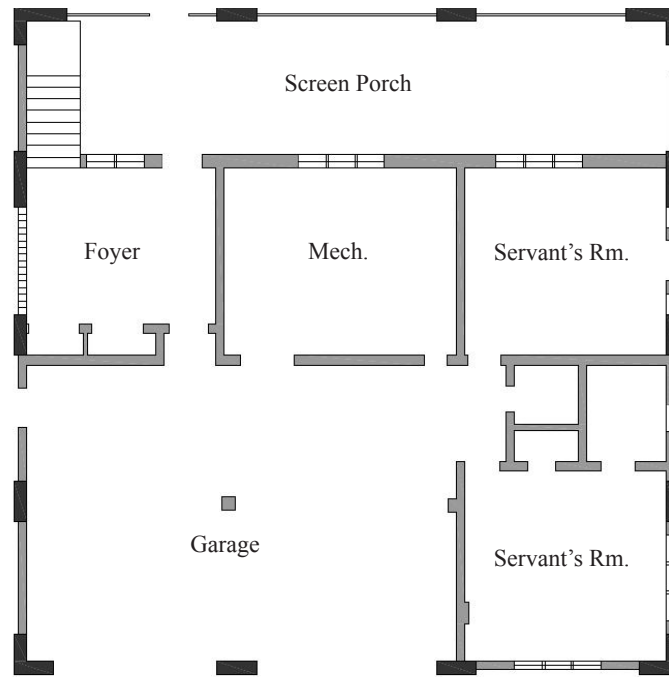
Initial design of the Panama House, Ground Floor Plan. Plan followed by Quarters K - R. Drawing by author based off plans from the Charleston Naval Complex Redevelopment Authority (RDA).
